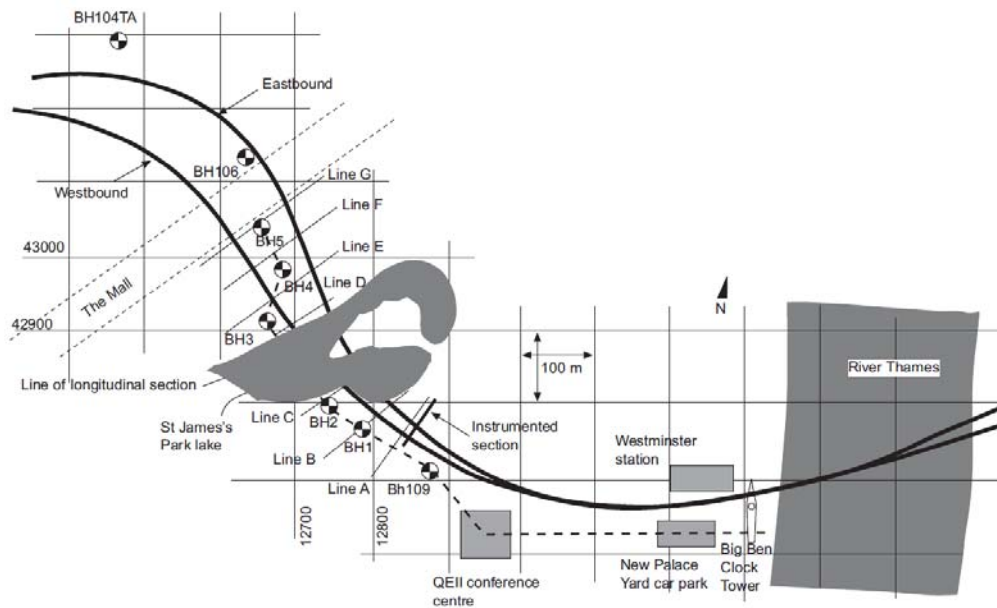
JLE tunnels between Westminster and Green Park, plan view (source: Standing & Burland 2006)
